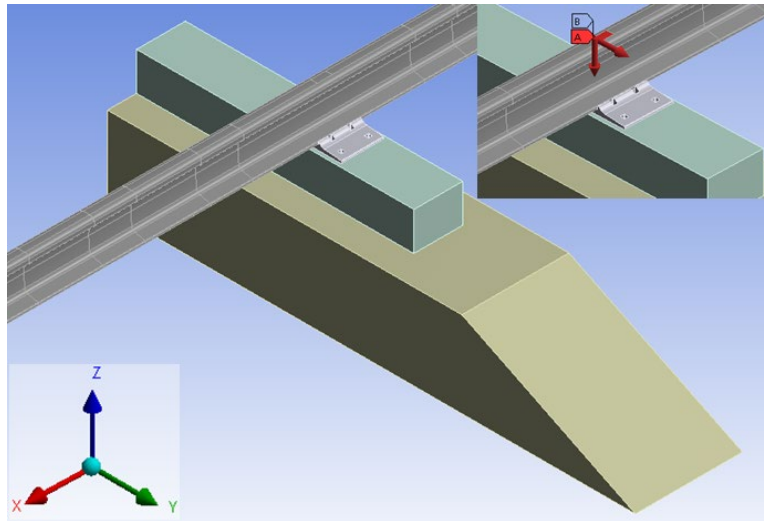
Finite element track model – detailed tie plate (14-inch AREMA plate shown)
